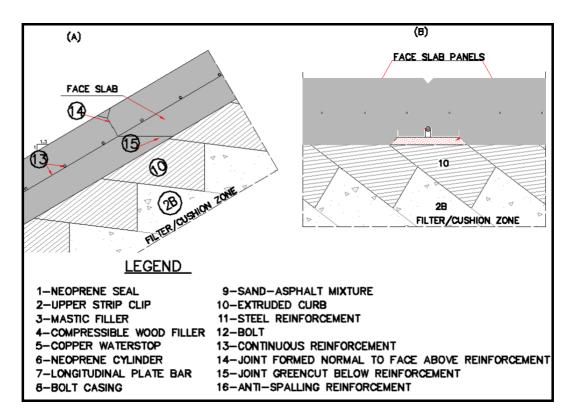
Horizontal construction and vertical contraction joints (Hidro Dizayn, 2007-c)
